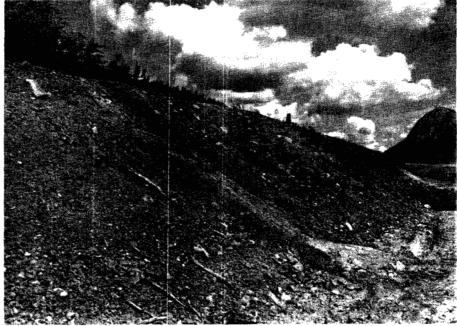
Backslope at 45°, silty soil, top of slope has slumped (upper left to lower right in picture). Alaska Highway, km 1390, reconstructed section. Other backslopes on this section are also cut at angles well in excess of 30 degrees as are backslopes at km 1100 (reconstructed section), km 1180 (reconstructed section), km 1345 (to be reconstructed).
